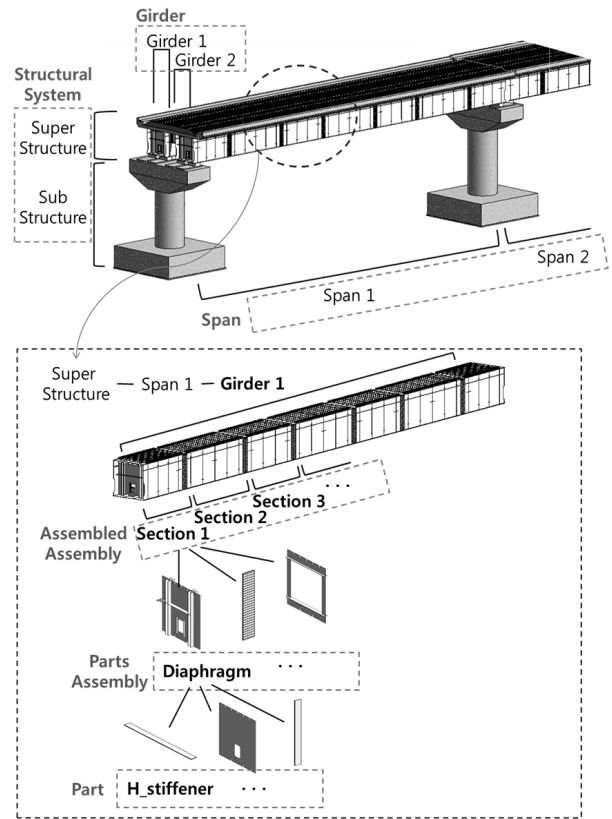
Component Identification Concept of Steel Box Girder Bridge
